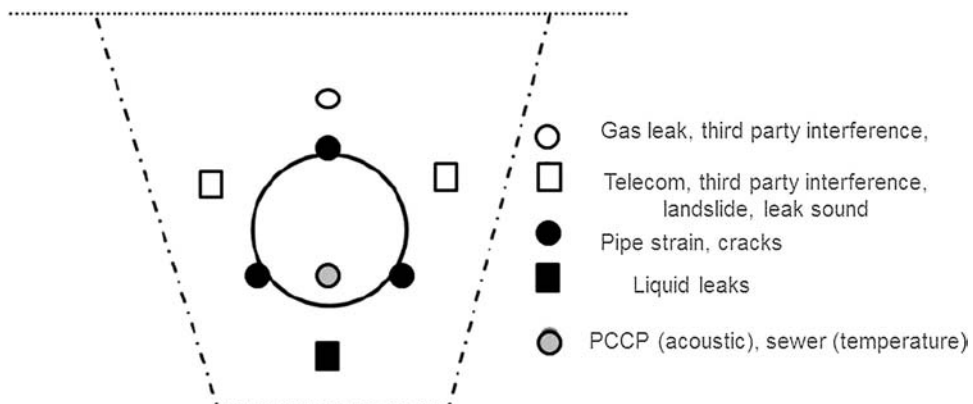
Pipeline sensor placement (PCCP is prestressed concrete cylinder pipe).²¹
